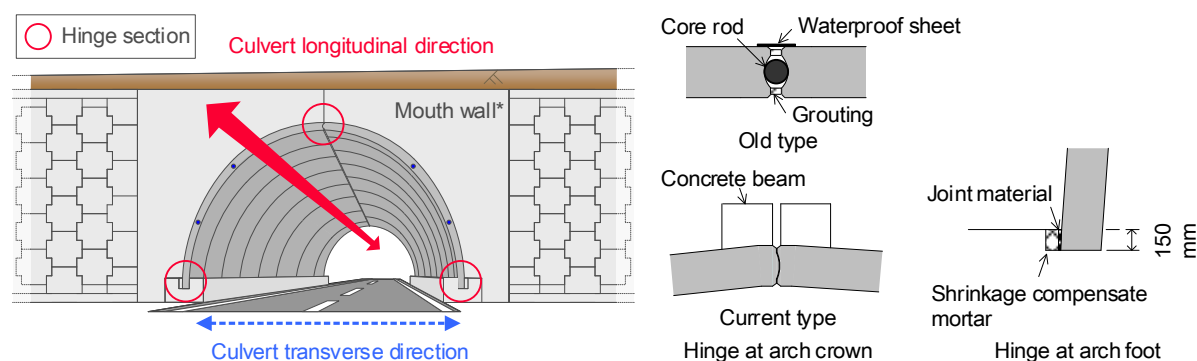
Structural outline of three-hinge type of precast arch culverts.
